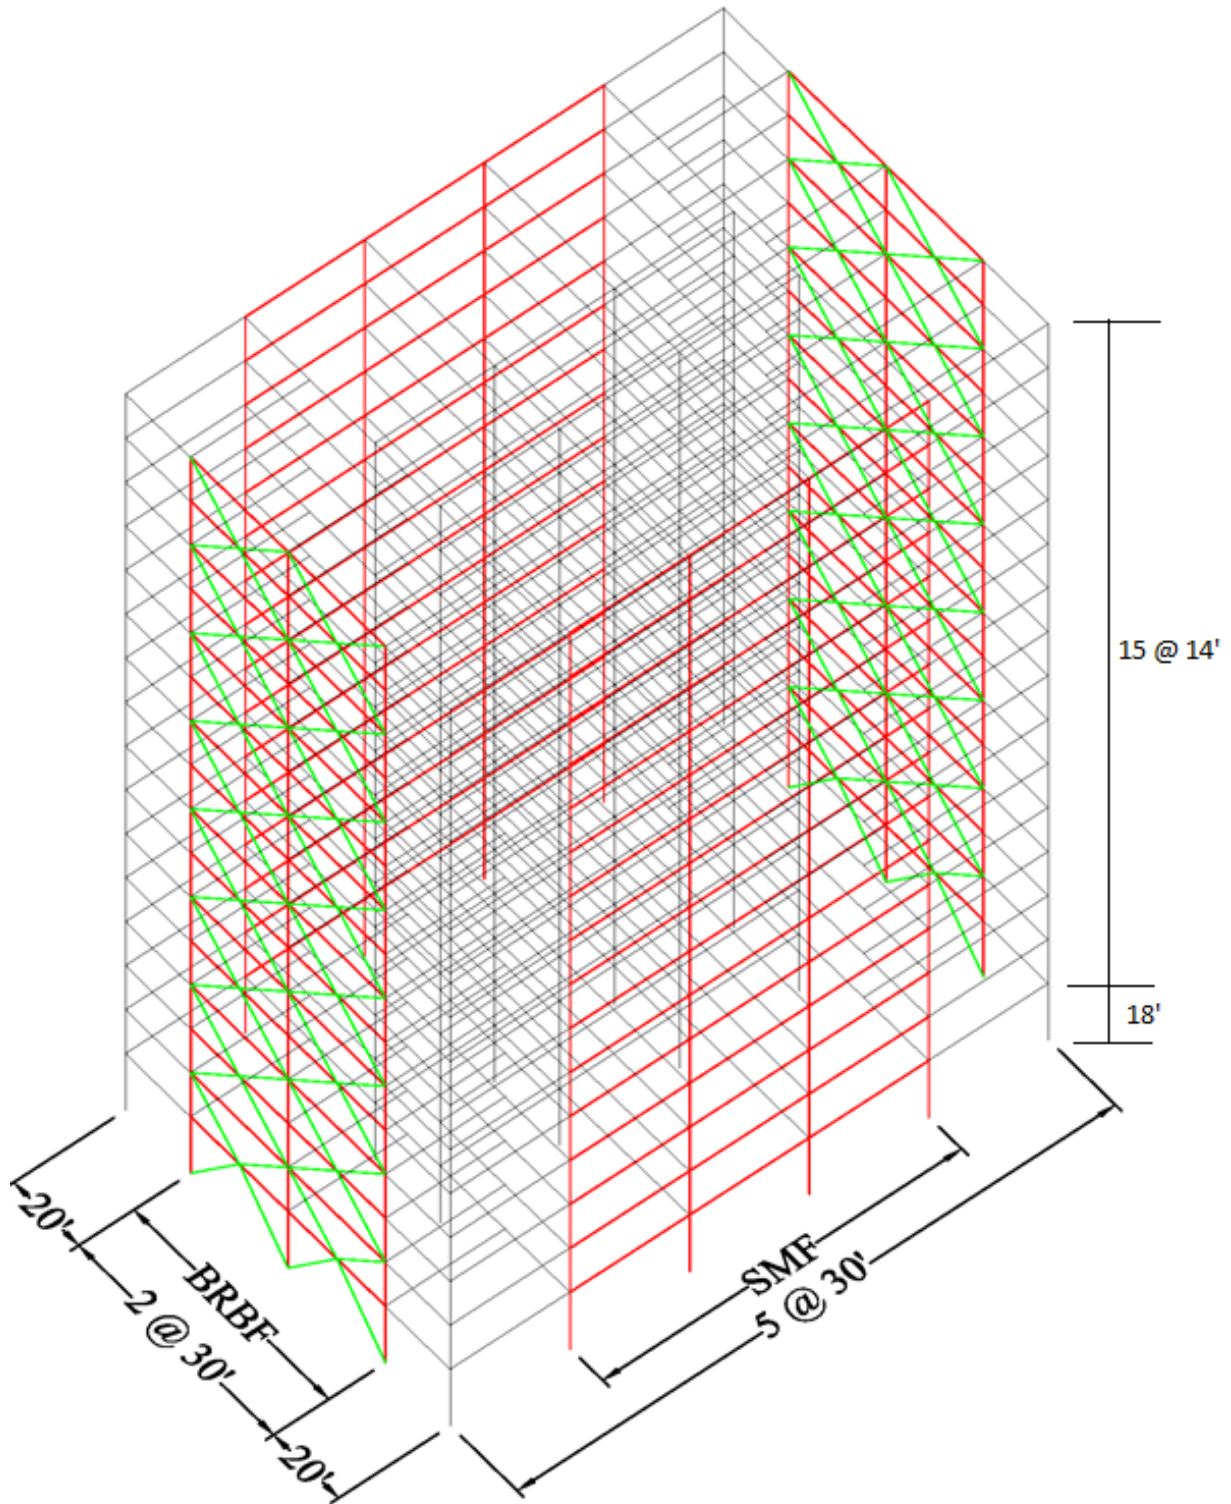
Isometric view of the 16-story archetype building (Bldg. ID: MB16).
